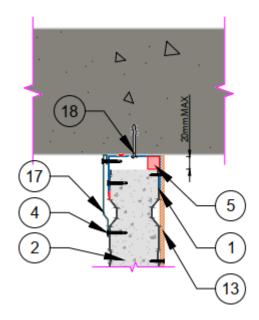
Dual wall system with vertical wall between horizontal walls – horizontal head detail – option 01
